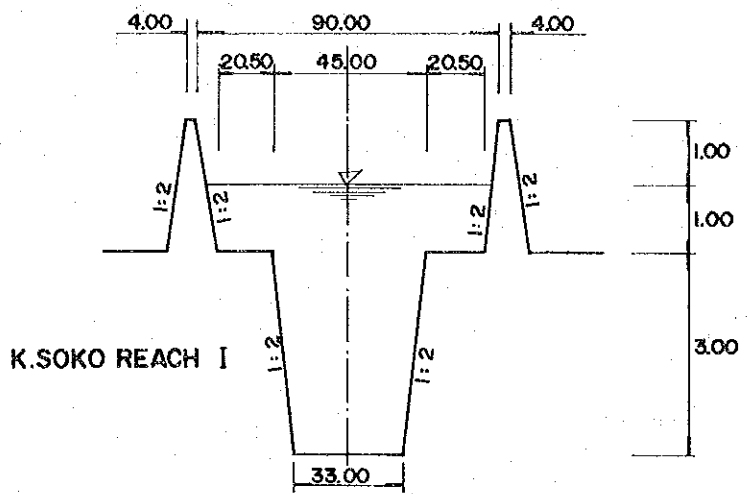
TYPICAL RIVER CROSS-SECTIONS FOR FIRST STAGE PLAN (5/6)
